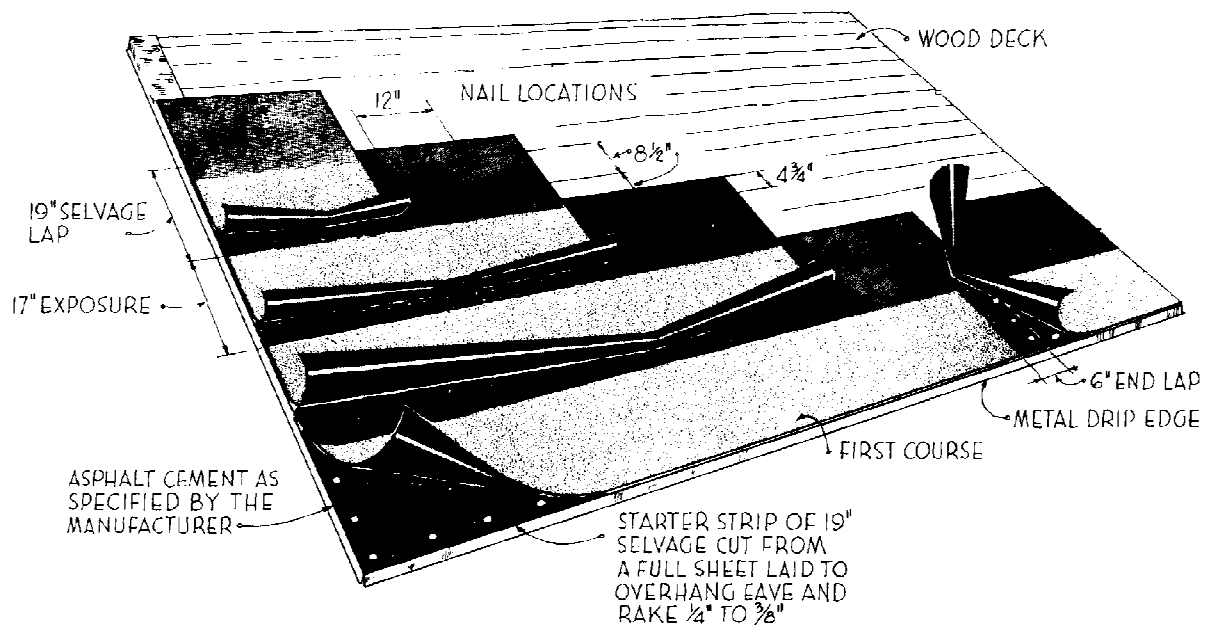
Application of double coverage (wide selvage) roll roofing parallel to the eaves.
